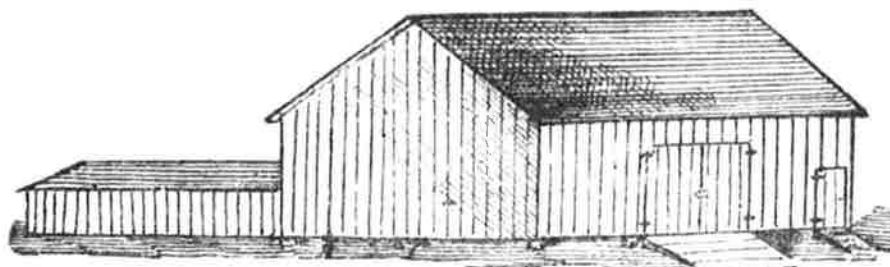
FRONT AND END VIEW OF OLD BARN.
